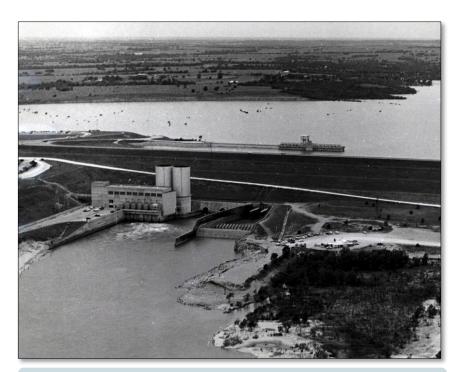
Ca. 1950 overview photo of Denison Dam, intake structure, powerhouse, and outlet works.
